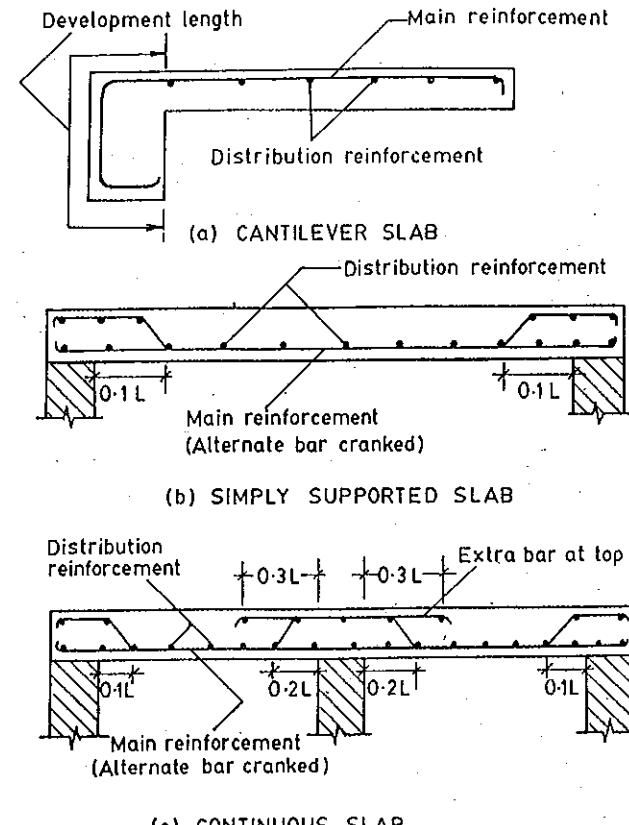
Reinforcement Detailing in One Way Slabs
